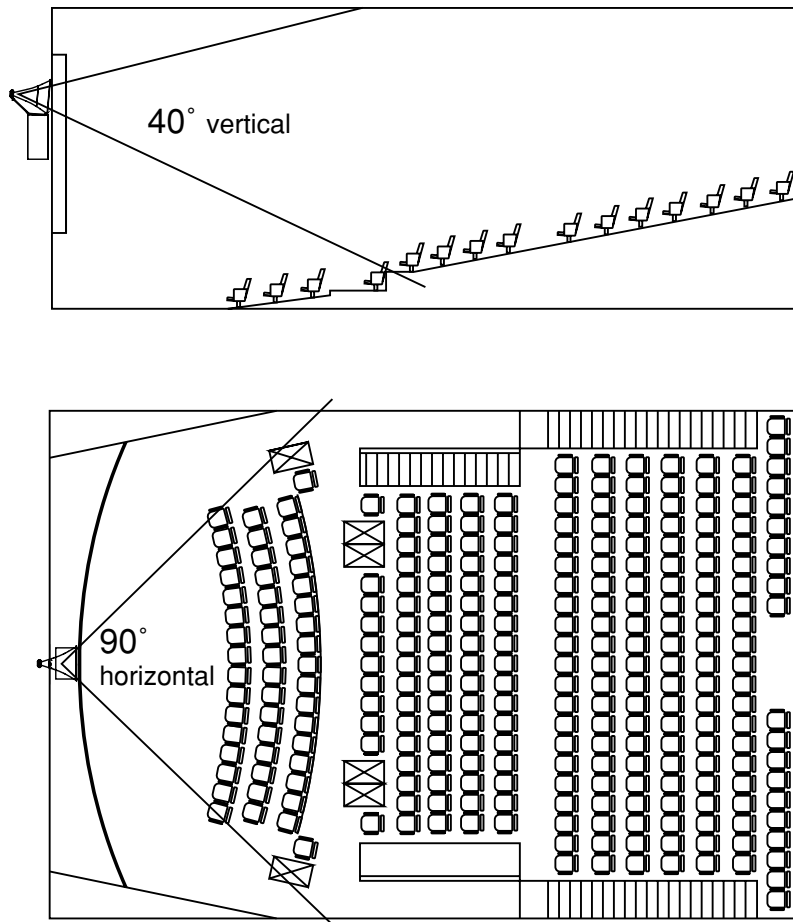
Elevation and plan view of cinema, illustrating conventional 40 by 90 coverage pattern.
